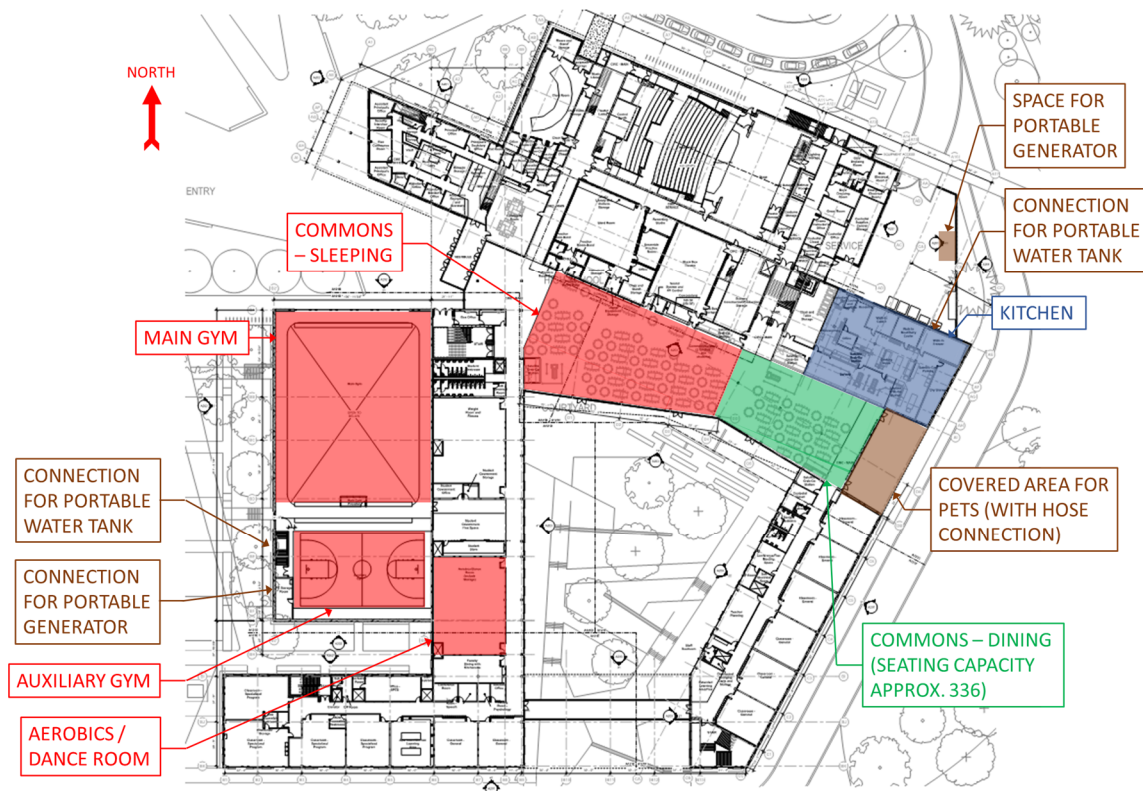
High School at South Cooper Mountain First Floor Plan
